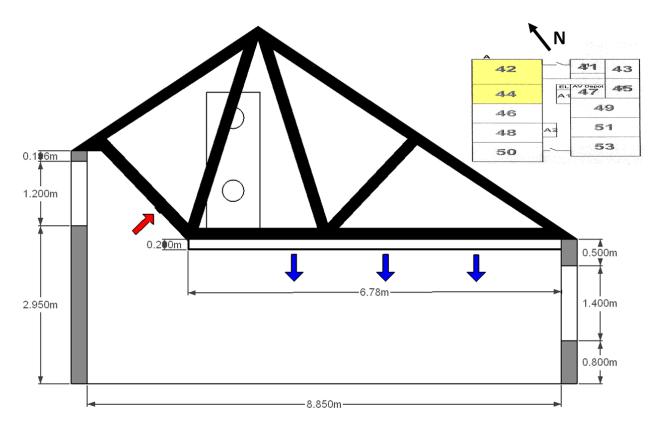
Section of the two classrooms at Vallensbæk School and a plan of the wing.
